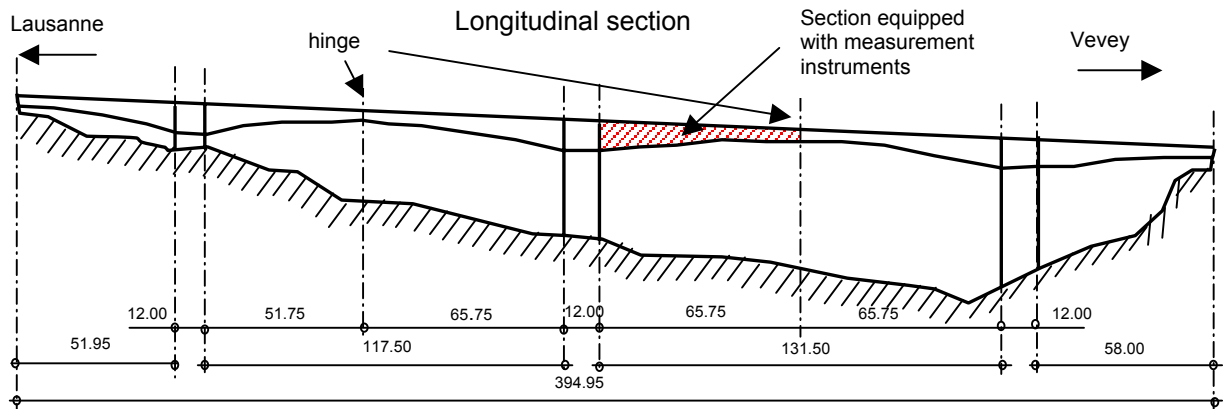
Longitudinal section of Lutrive Bridge (values in meters)
